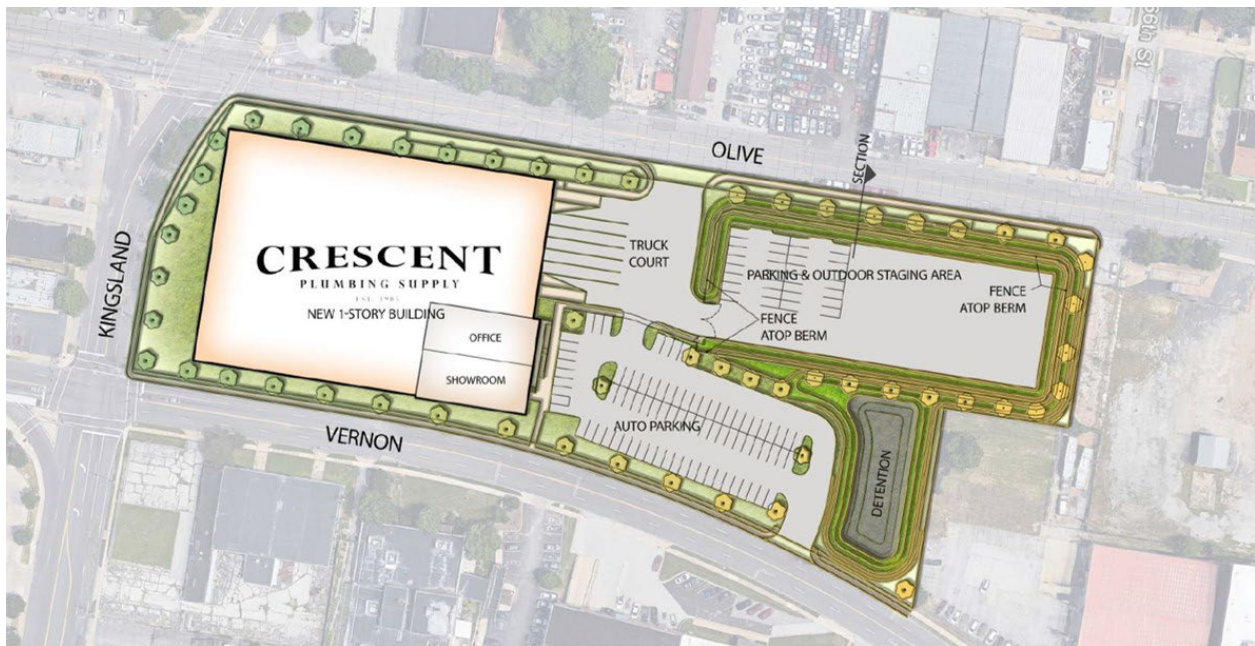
Site plan for the Crescent Plumbing location at 6610 Olive Boulevard.
